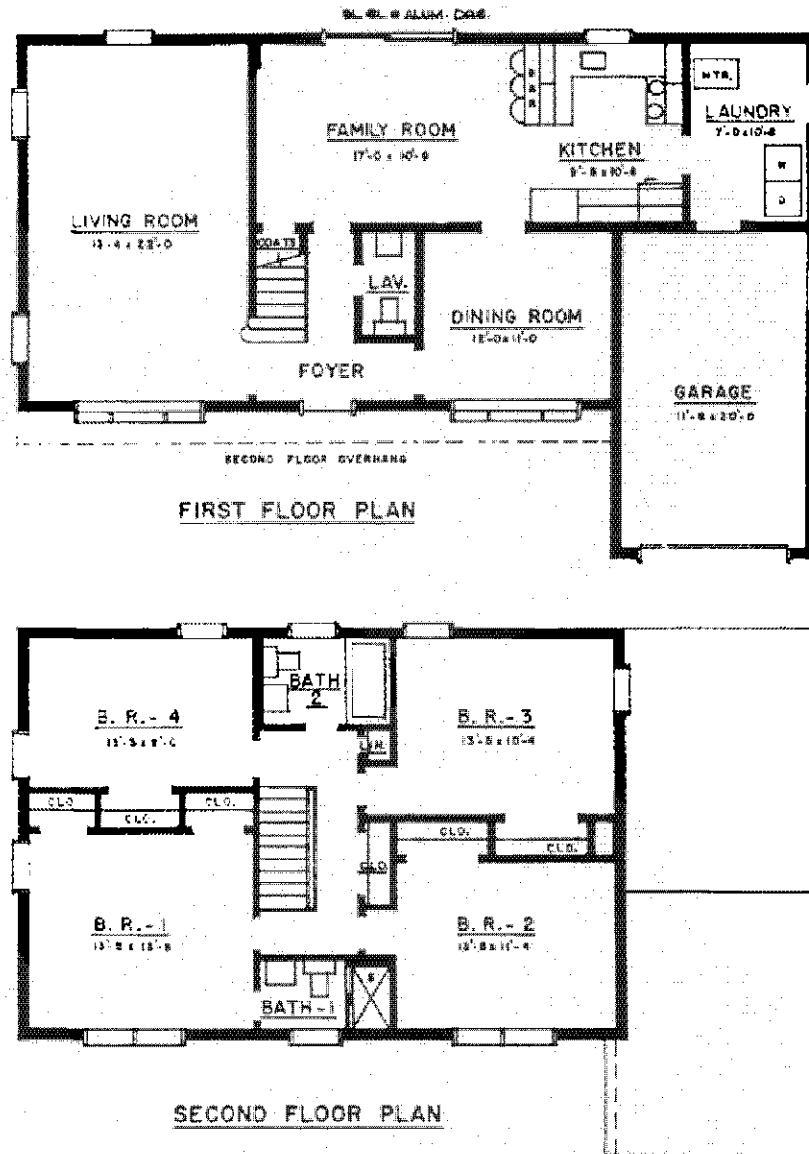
The Colonial model, version with four bedrooms, floor plans, 1964. Author's collection.
